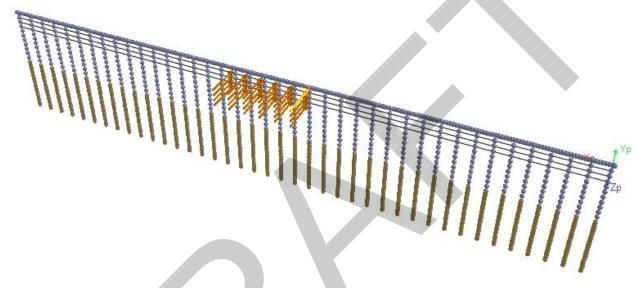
Layout – Load Case 1 (Section 1 – Soil C2)
